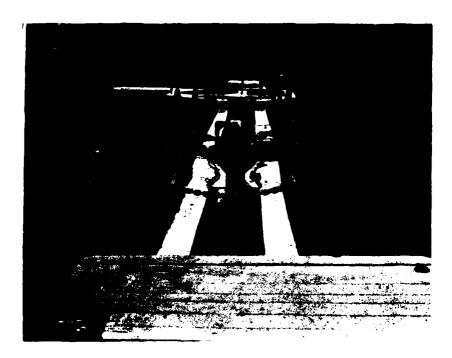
Parshall Flume, Otis ANG Base Wastewater Treatment Facility, Mar 84.
